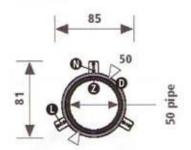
Detail drawing B 50 mm Silent thickwall HDPE pipe with floor waste in FireShield Series 2 50 mm retrofit to slab
